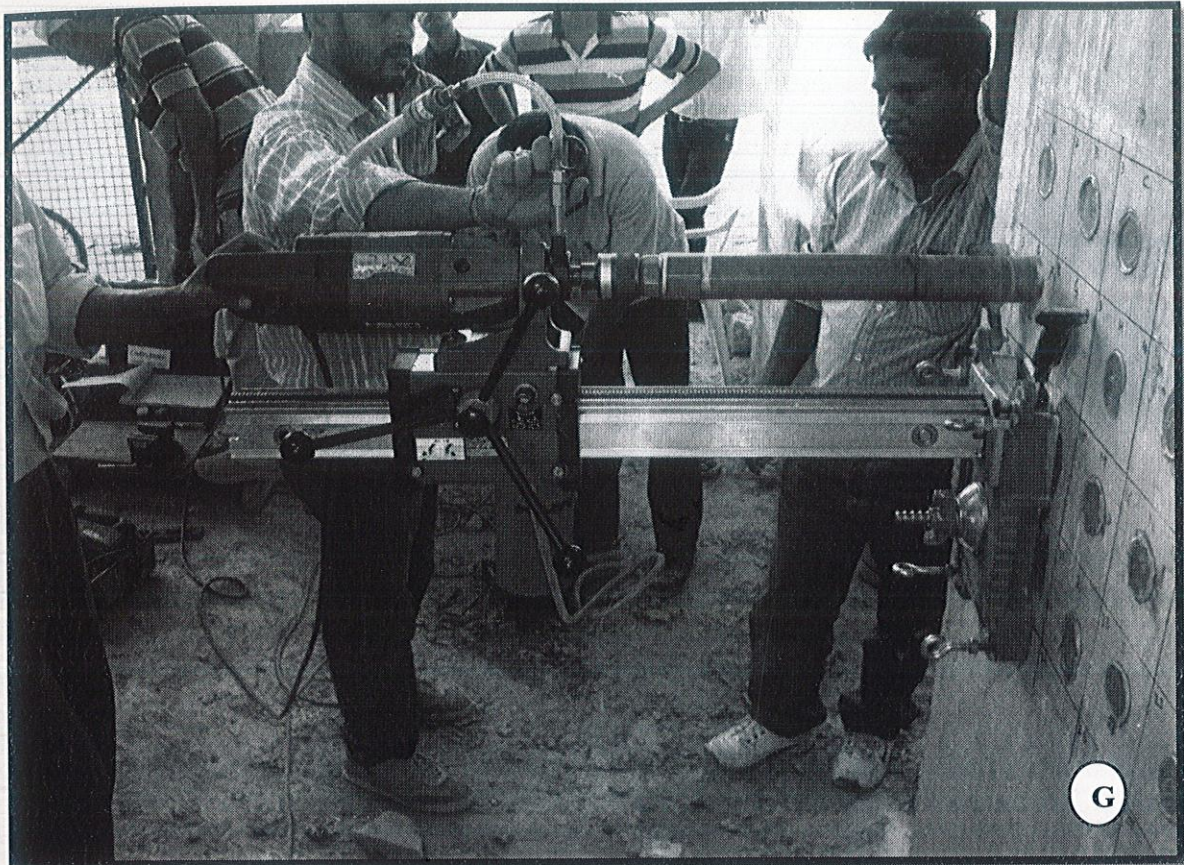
(G) Completely mounted Core-Cutter Assembly; (H) & (I) Extraction of core
